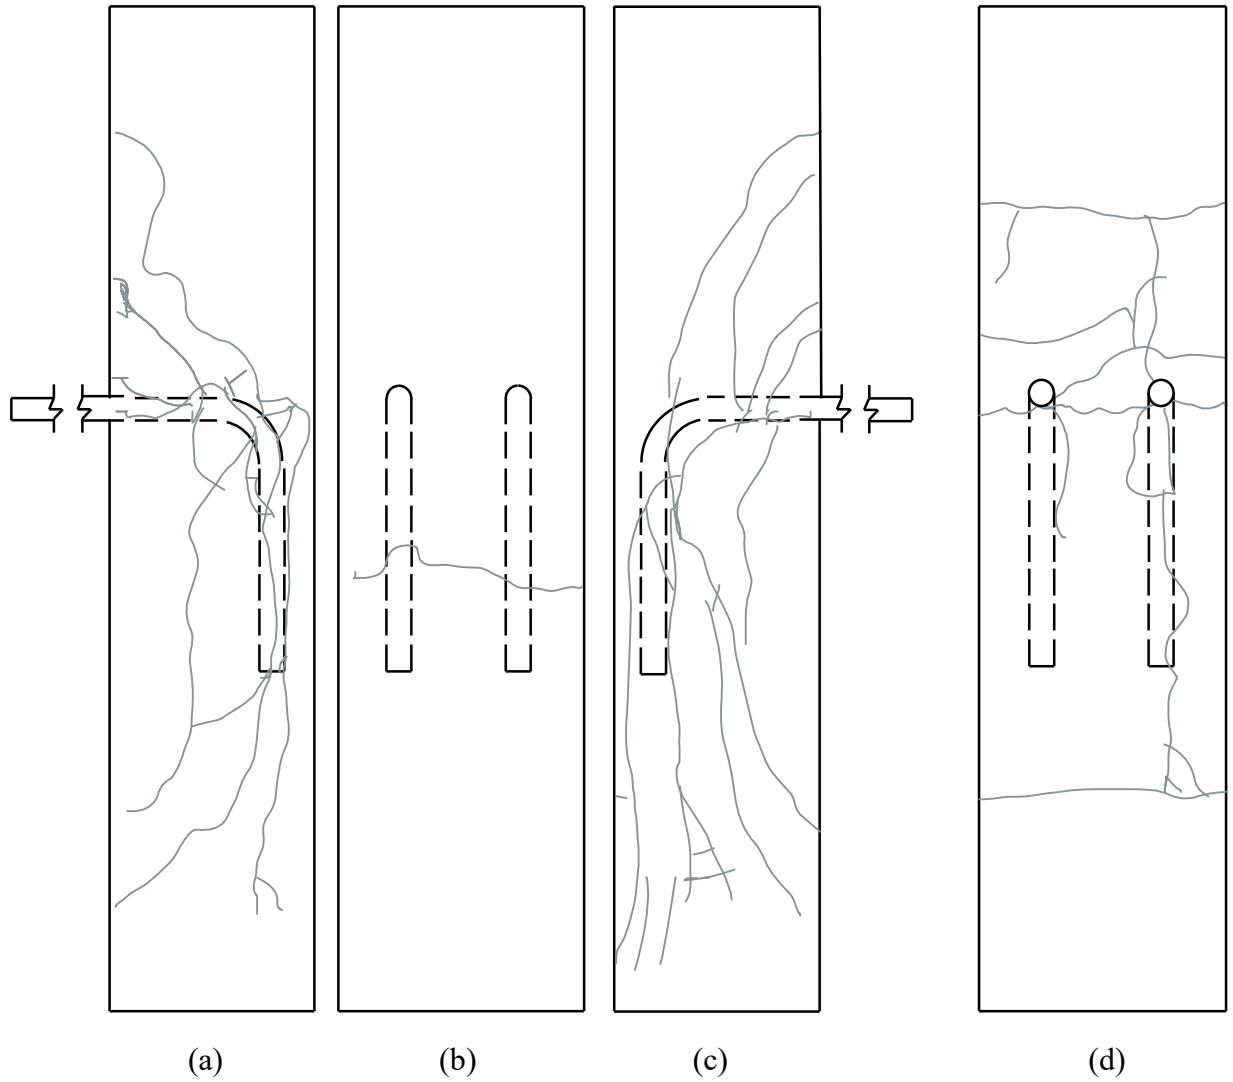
Crack pattern at maximum normalized tensile load for beam-column joint specimen P5-90: (a) west side face, (b) back face, (c) east side face, and (d) front face
